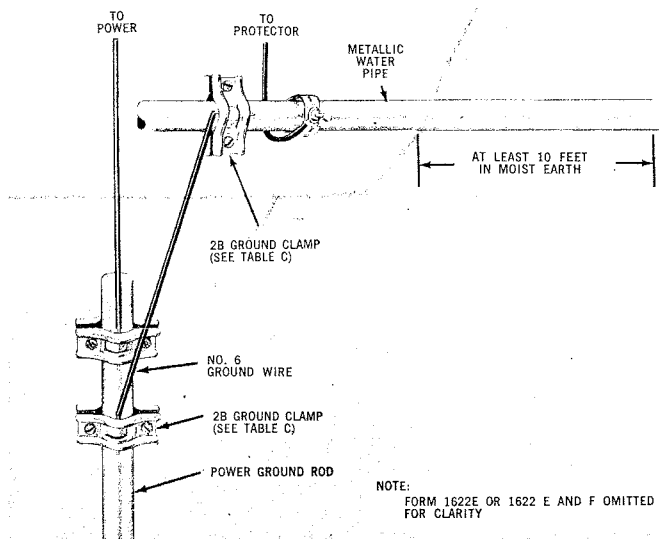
Grounding to Metallic Water System—Power on Ground Rod at Premises
